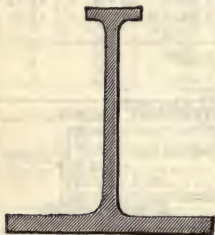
Cross-section of Cast-iron Lintel of Ideal Form
